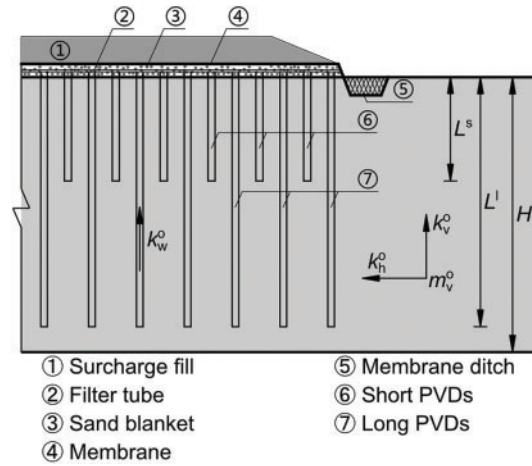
Schematic diagram of a surcharge preloading system with alternating long-short PVDs for ground improvement
